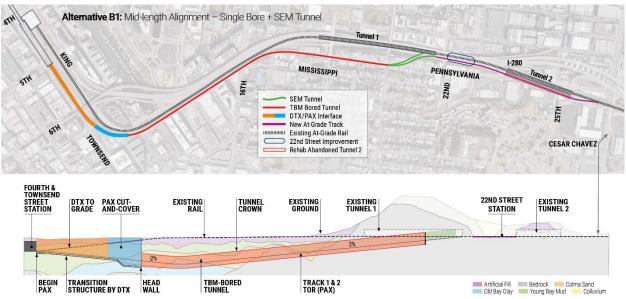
Mid-Length Alignment – Single Bore + SEM Tunnel. Rail and Existing Caltrain Tunnels Noted. See also Appendix B.
